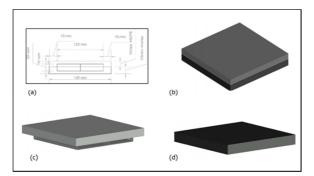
Experimental Tile layout, (a) Side view with labels and dimensions of actual average size of experimental tile, b.) Expected output-3D SW Isometric View, (c) 3D Isometric View of HDPE with Galvanized wire mesh, (d) Mortar 3D Cross sectional view
